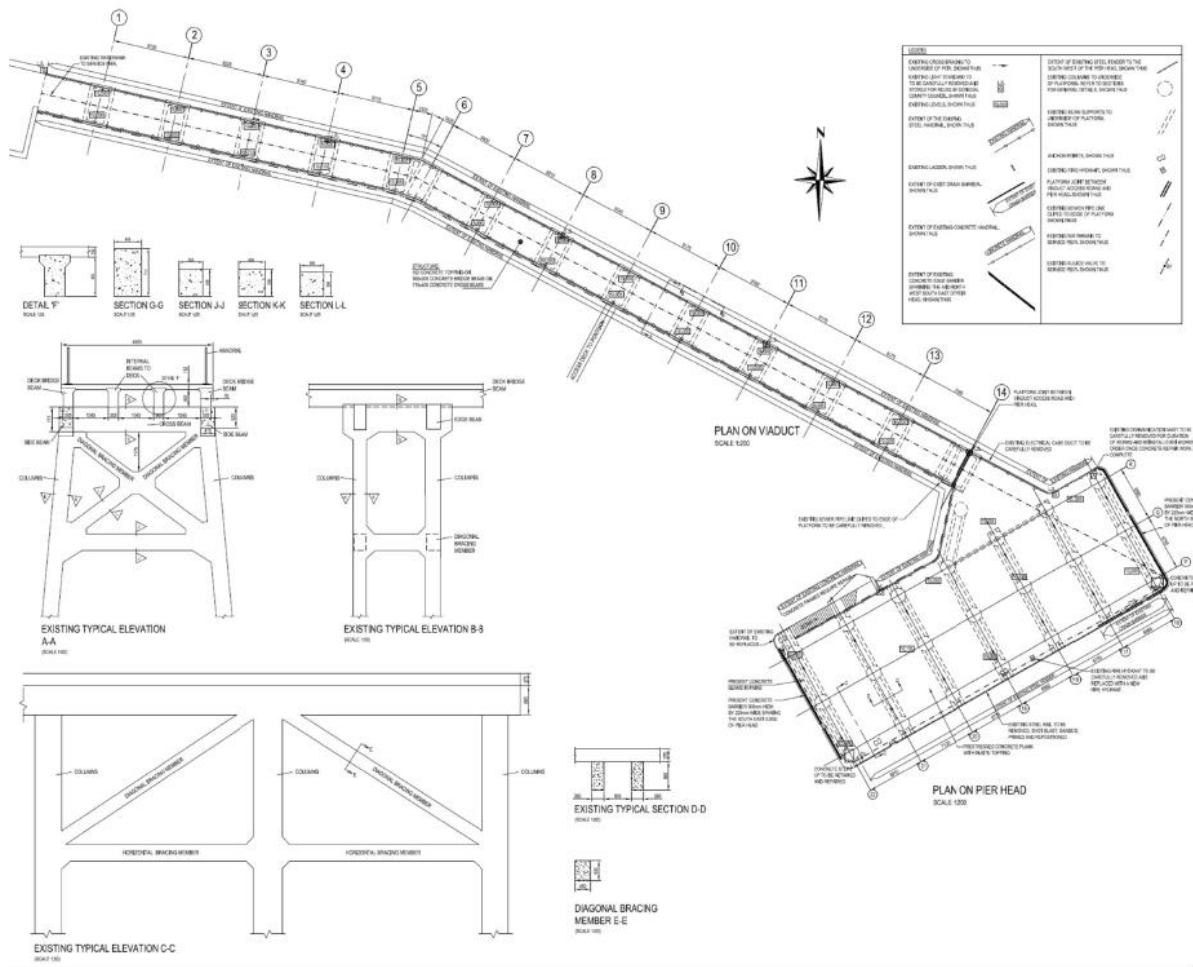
Pier Layout Extract from Rathmullan Pier Condition Report (Nicholas O' Dwyer Ltd. 2021)
